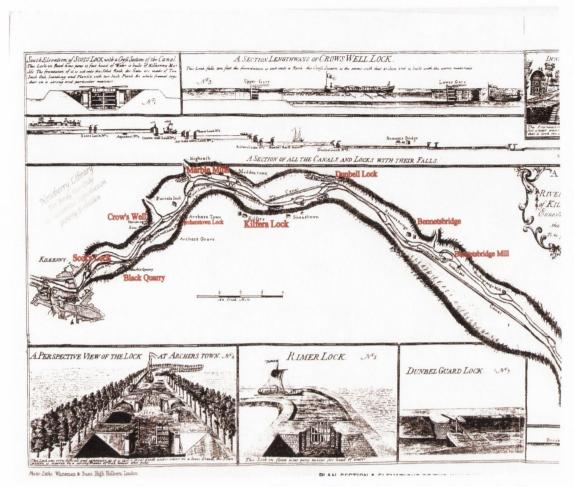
Plan and sections of navigation from Kilkenny to below Bennetsbridge, with main locks and areas mentioned in text highlighted.
